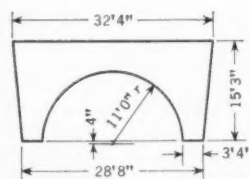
Each concrete arch at ground-floor level supports two-column bent for full height of building.
